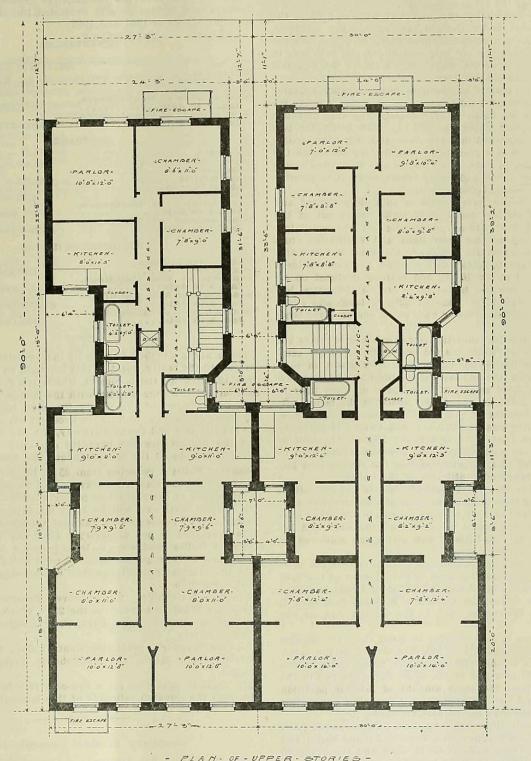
½. PLAN FILED FOR TWO TENEMENTS UNDER THE OLD LAW AT NOS. 6-10 BARROW STREET.
